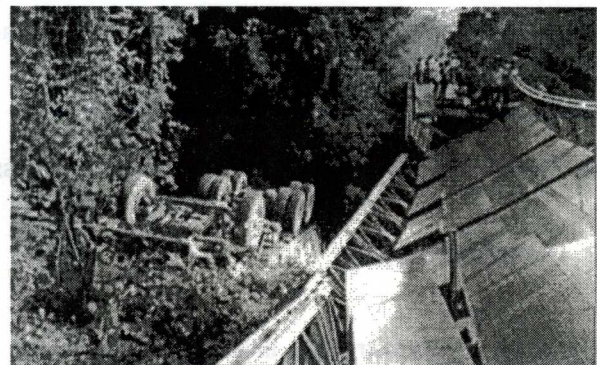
the collapse of a bridge on the road from Siem Reap to Bantey Srey temple on April 10, 2004
